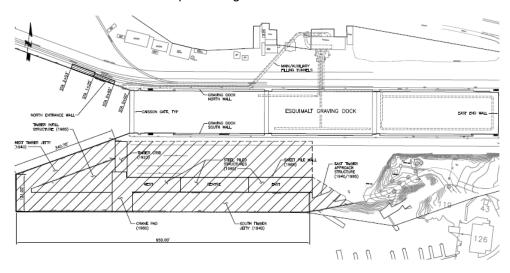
Schematic Plan of Esquimalt Graving Dock
